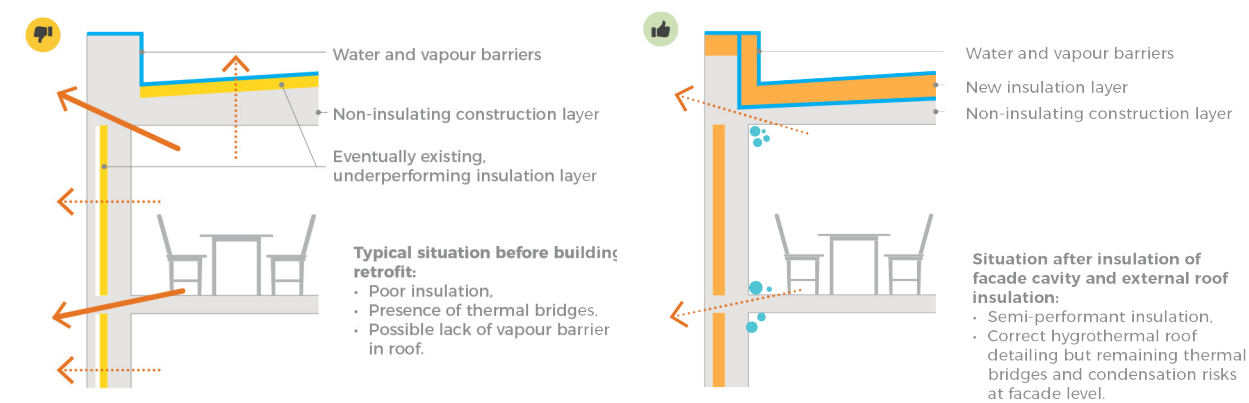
Insulation of Facade Cavity and External Roof Insulation Example [51]
